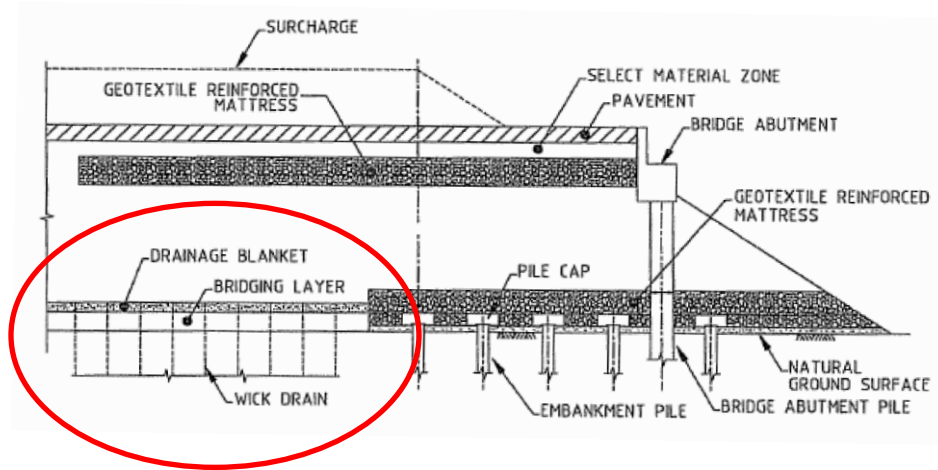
Schematic Arrangement of Approach Embankment Treatment with Wick Drains and Driven Piles (Hsi and Martin, 2005)
